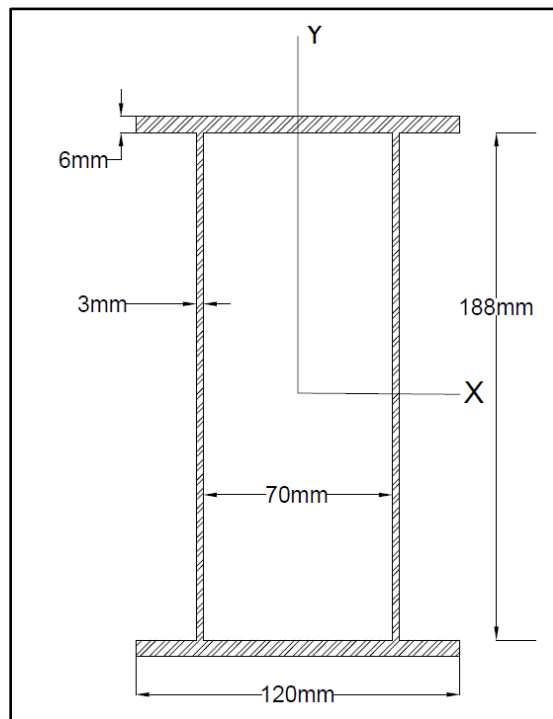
Typical Cross-Section of The Steel Beam Double Web.
